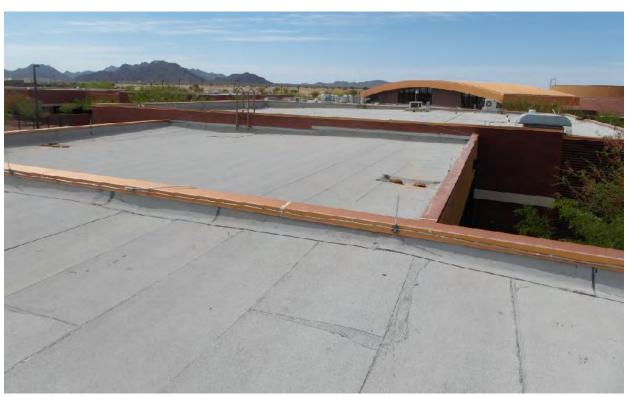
View of Tribal Governance Center Roof (facing South)
